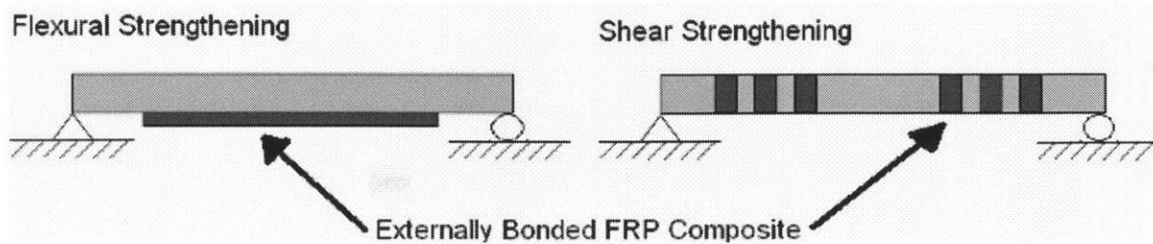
Flexural and Shear strengthening of concrete beams by externally bonded FRP composites
